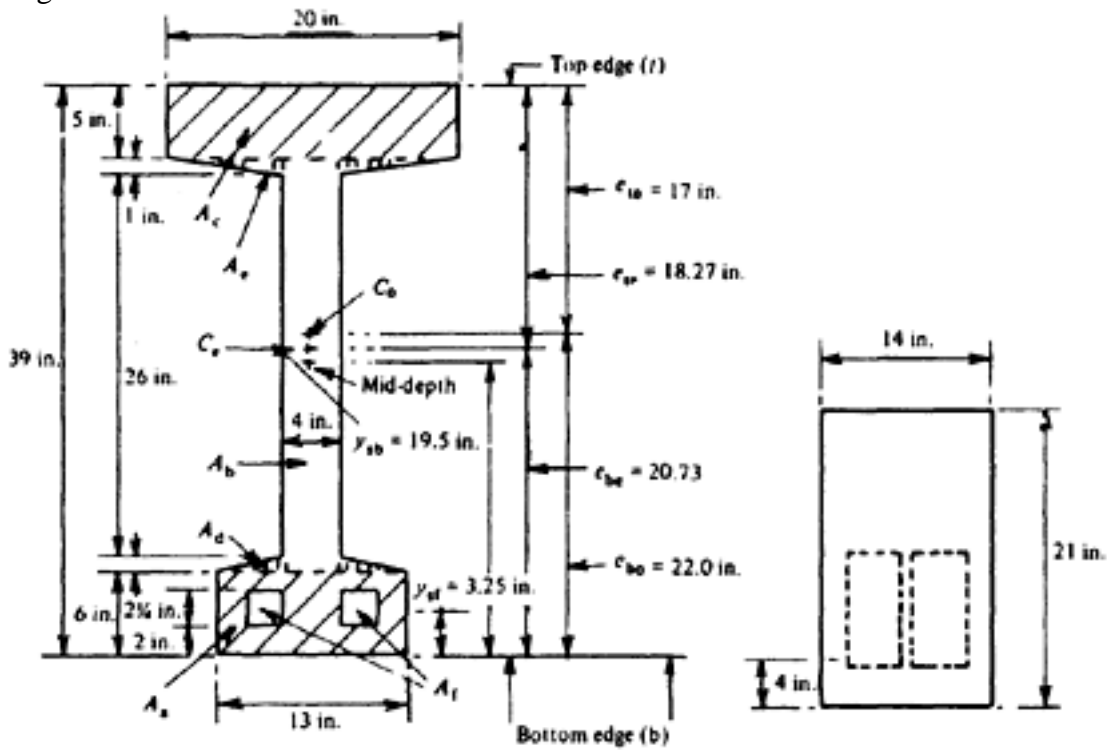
Cross-section at midspan and end elevation of beam in Figure 9.26
